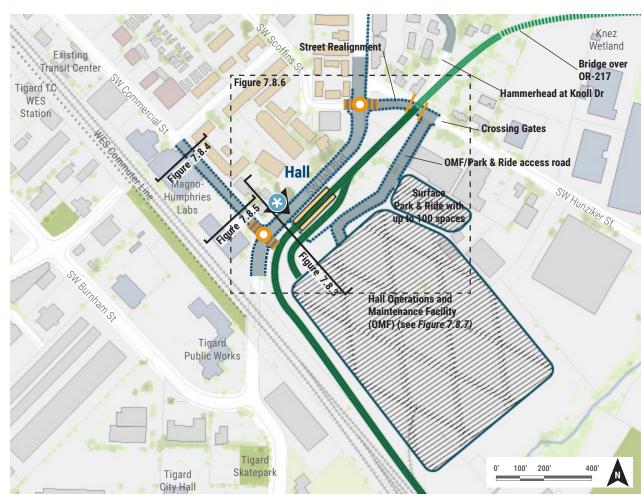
DRAFT Hall Boulevard Station overview
